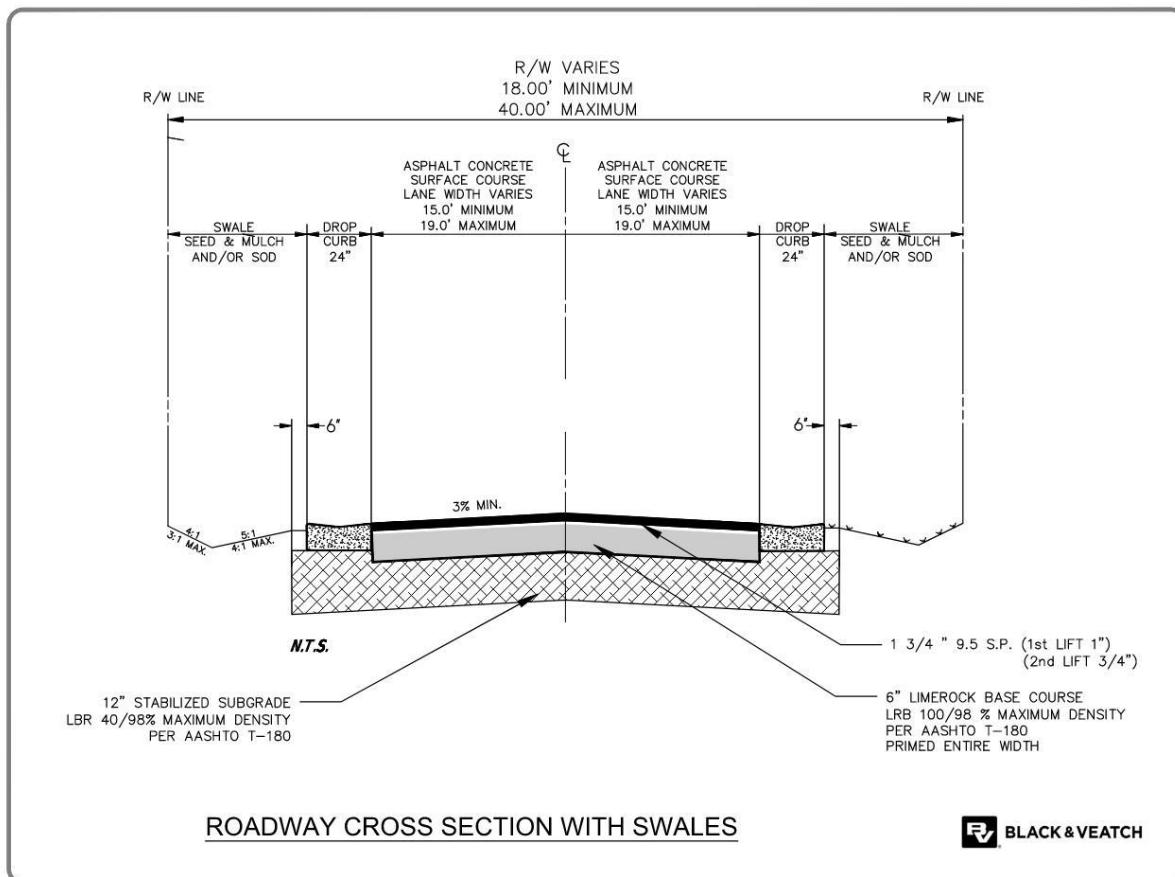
Standard Detail Depicting a Typical Roadway Cross Section with Swales
